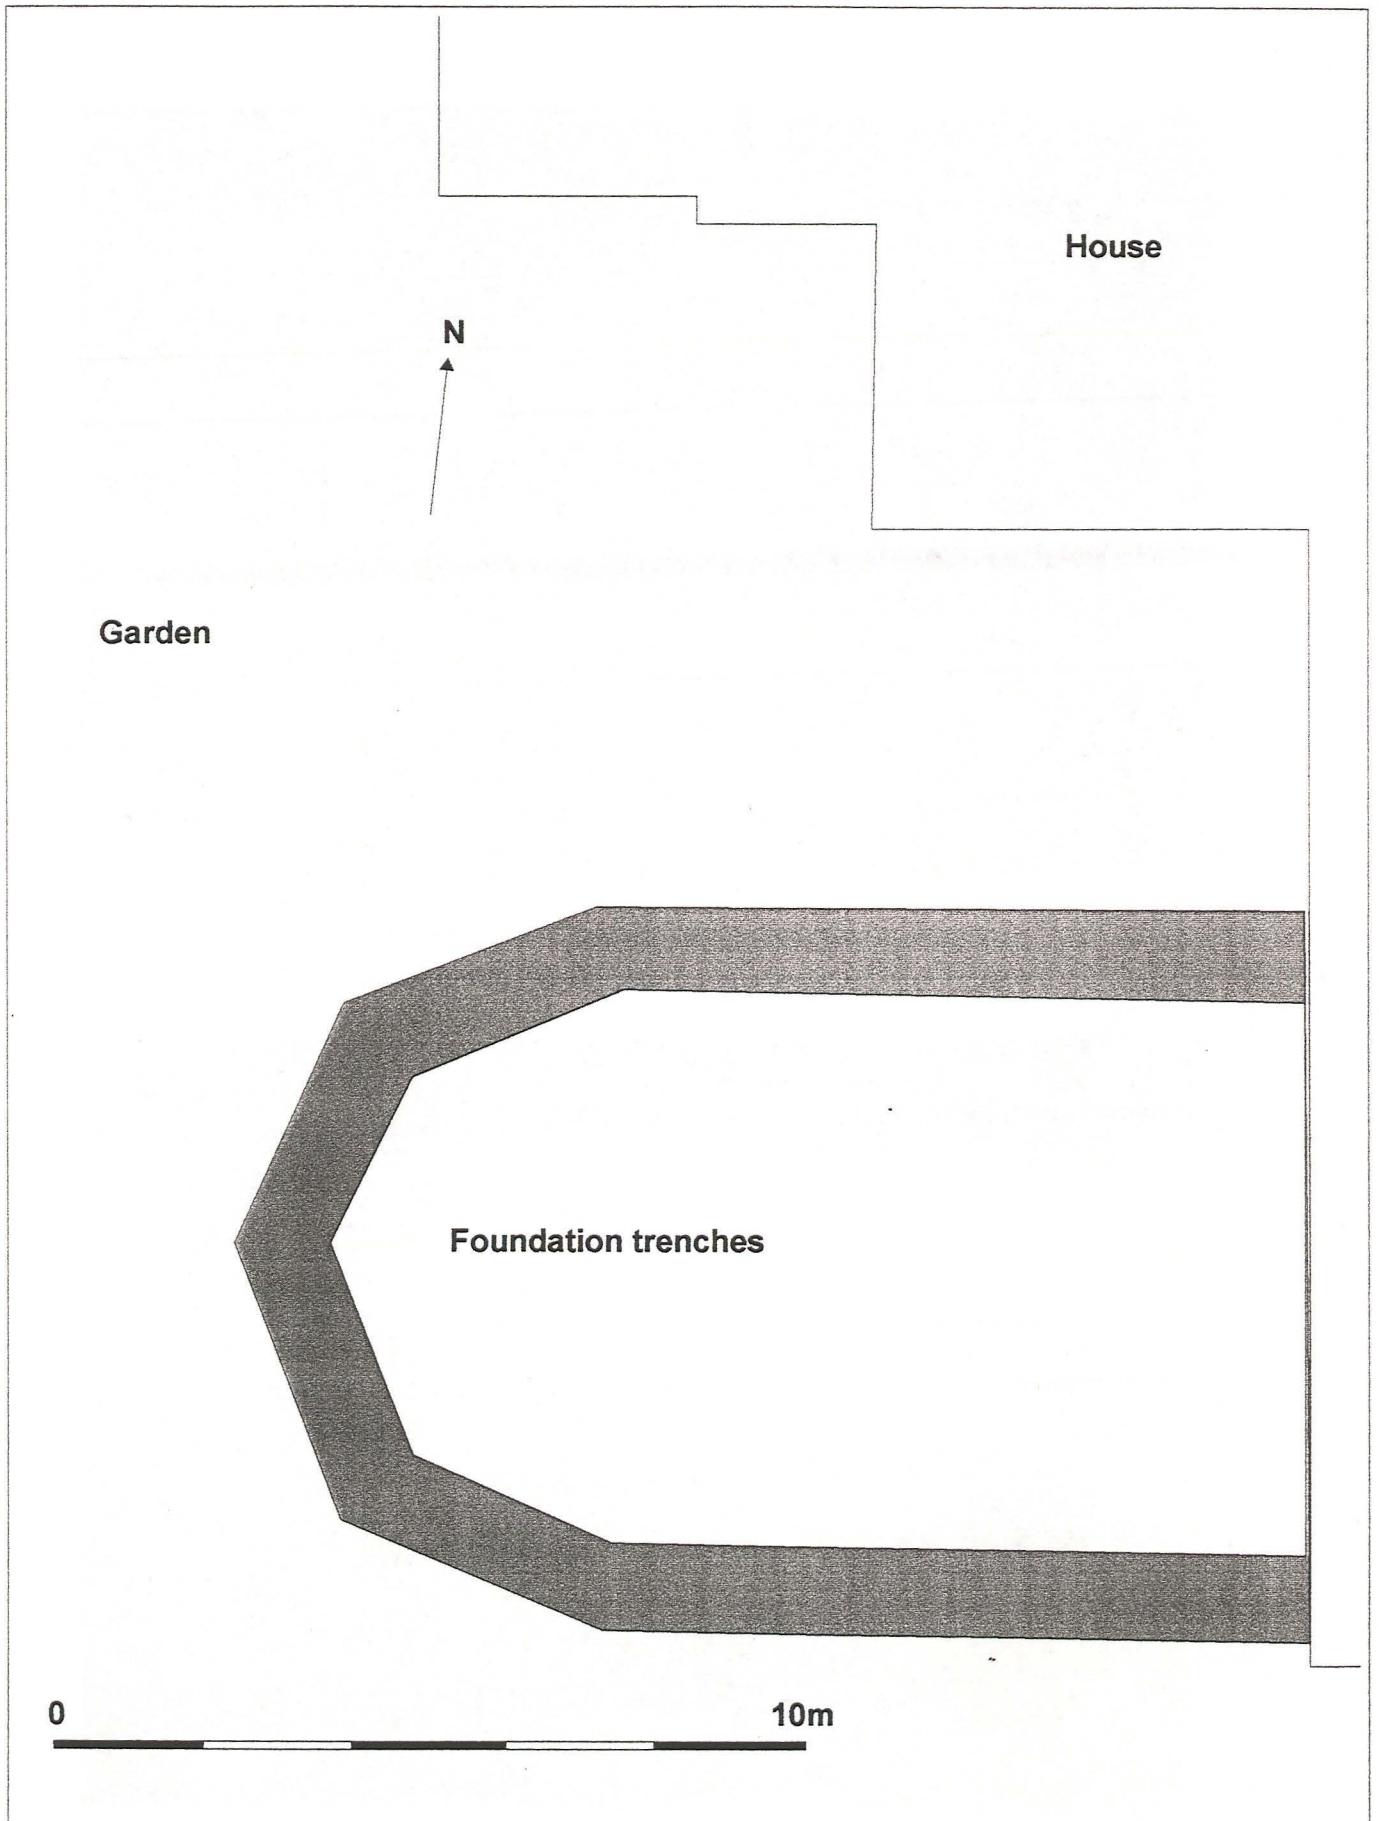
Plan of foundation trenches, based on a plan provided by the client
